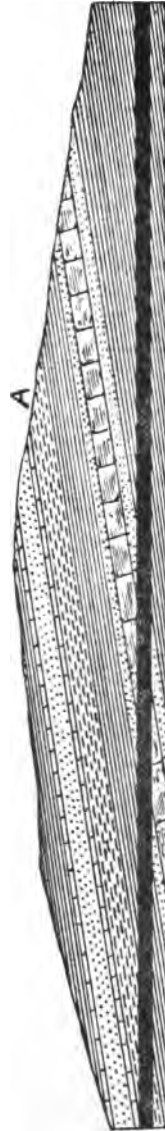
BUCKHORN WESTON TUNNEL, THROUGH KIMMERIDGE CLAY. A, Water-bearing bed, drained by a top heading.
